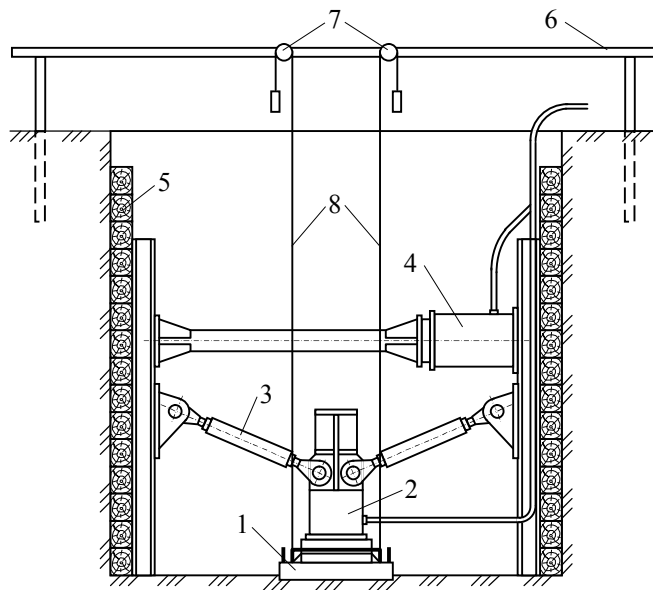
Model of the tool for soil stamp test in the anchor design pits: 1 – stamp; 2 – jack for stamp loading; 3 – screw supports; 4 – jack for expansion-support; 5 – support of the top; 6 – geodesic system; 7 – tool for deflection measurement; 8 – rod
